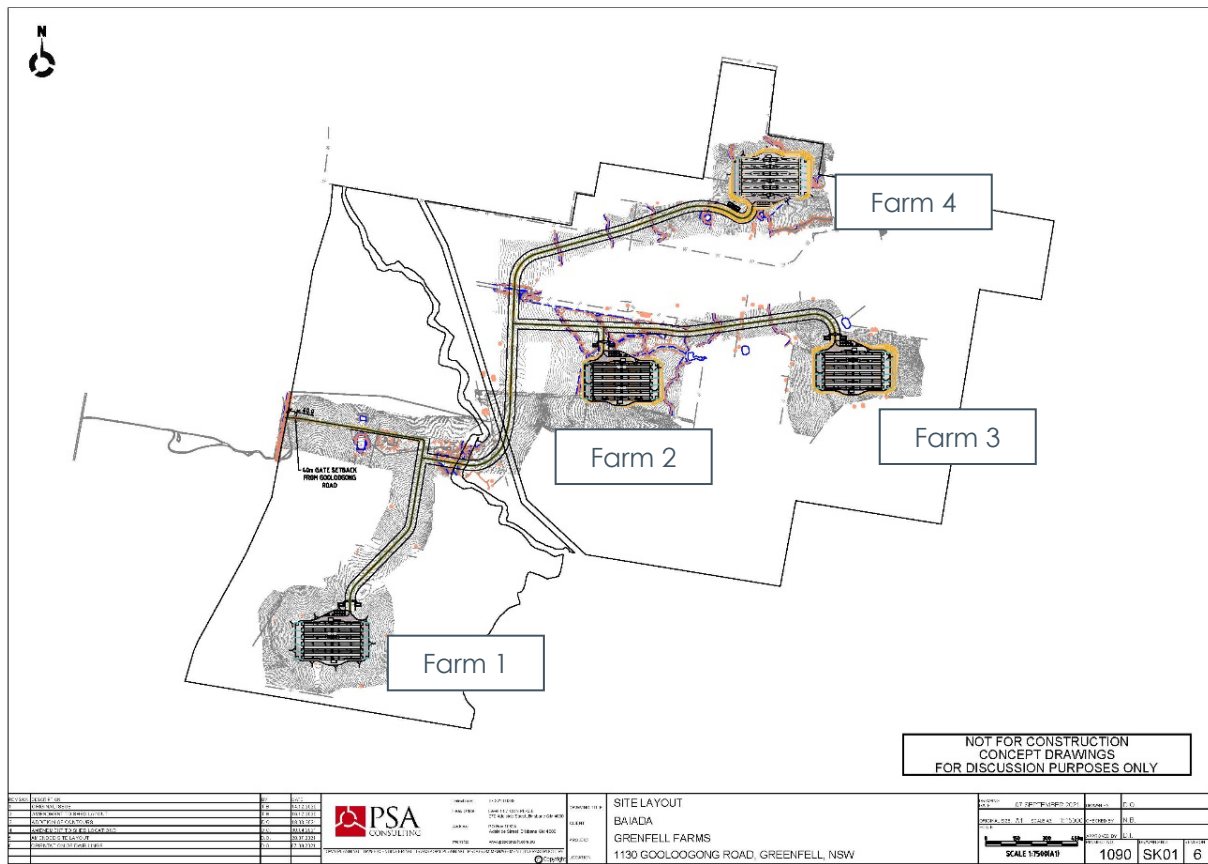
Proposed site layout (Source: PSA Consulting Pty Ltd)
